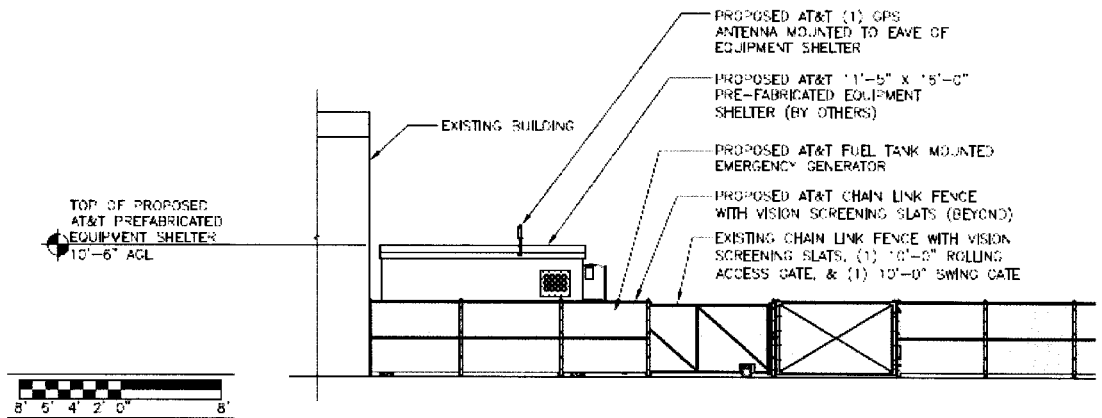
Current project plan detail (Source: AT&T; scale incorporated by J. Kramer)
